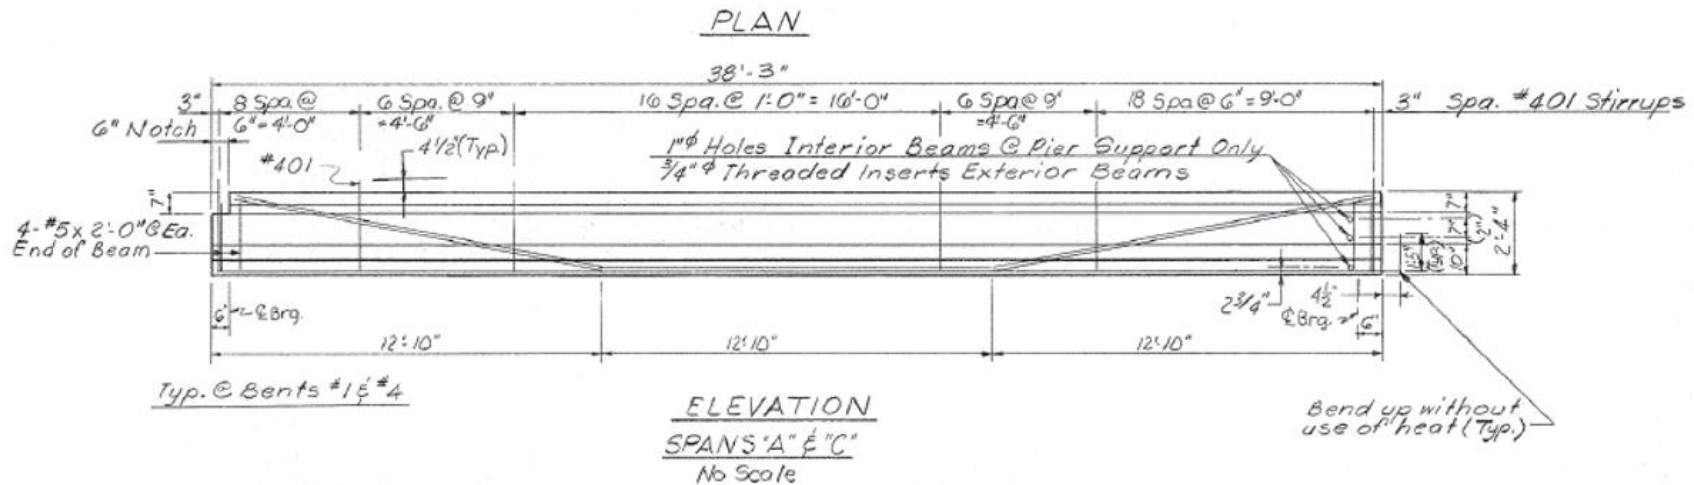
Elevation of Test Specimens (from INDOT 1987)
